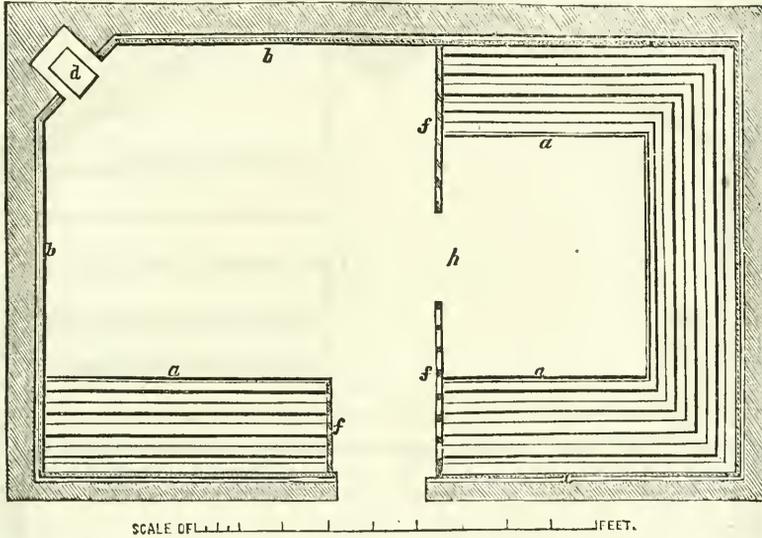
PLAN OF MR. MOORMAN'S FRUIT ROOM.
